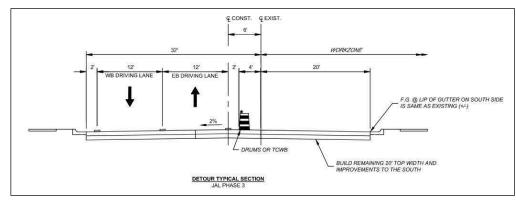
B. NM 128 MOT Typical Section – Enhanced Two-Lane Construction
